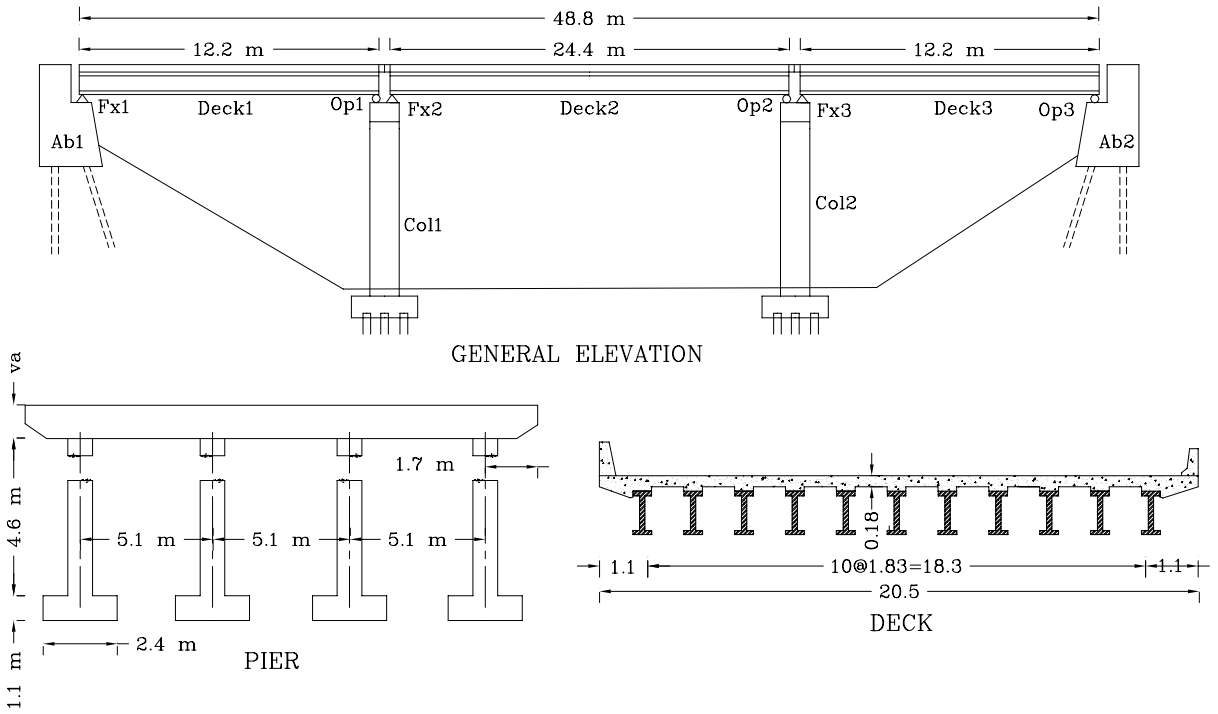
General view of multi-span-simply-supported bridge with steel girders
